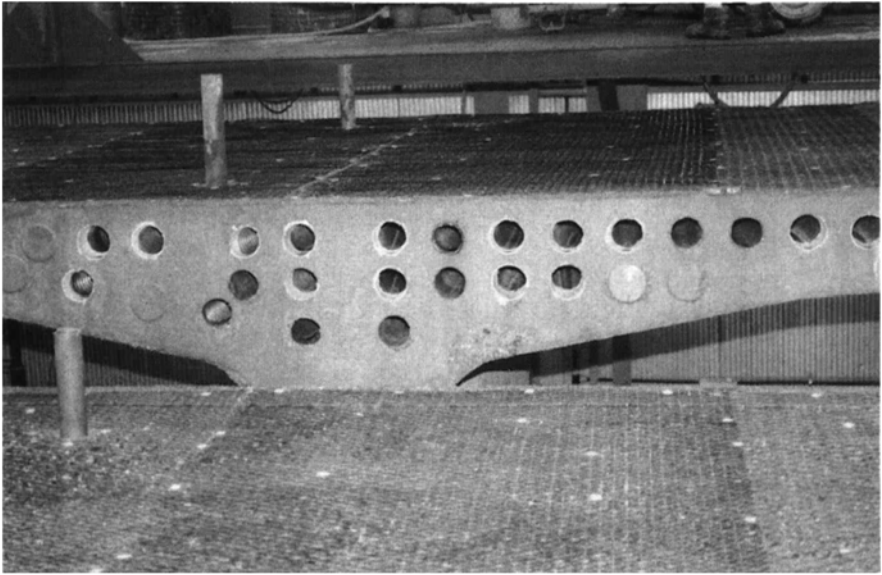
A mixed metal oxide CP anode being cast into a newly constructed precast reinforced concrete element. These elements were used to form the pre-cast deck of a road bridge at Hauteville-sur-Fier, France.
